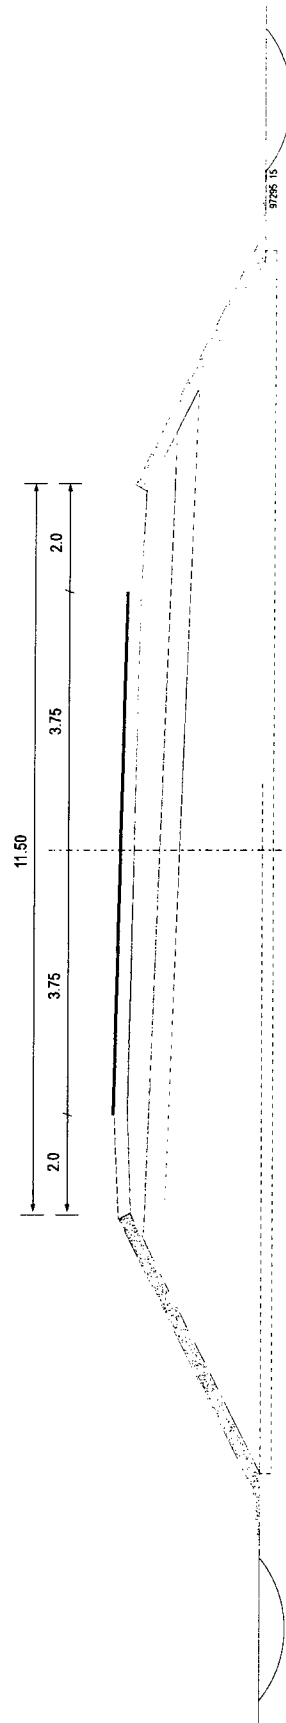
Typical Cross Section: 2-Lane Rural Highway
